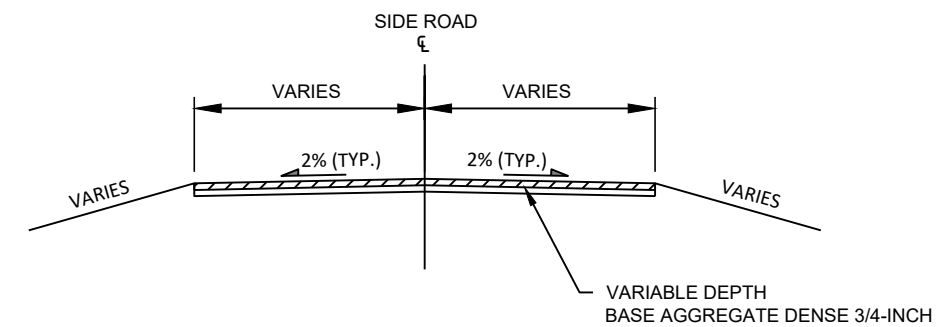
DETAIL OF SIDE ROAD BUTT JOINT - RURAL
